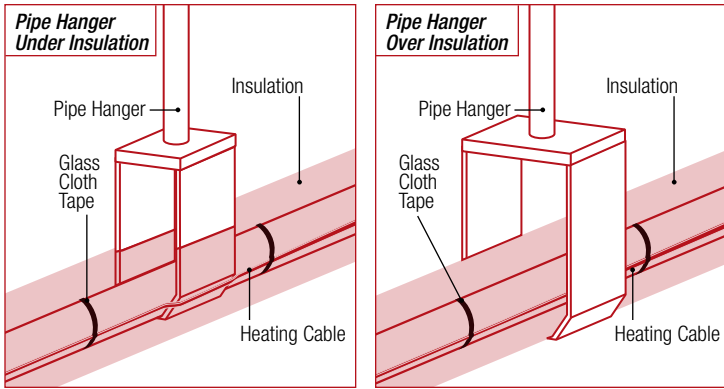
Securing Heating Cable to Pipe Hanger
